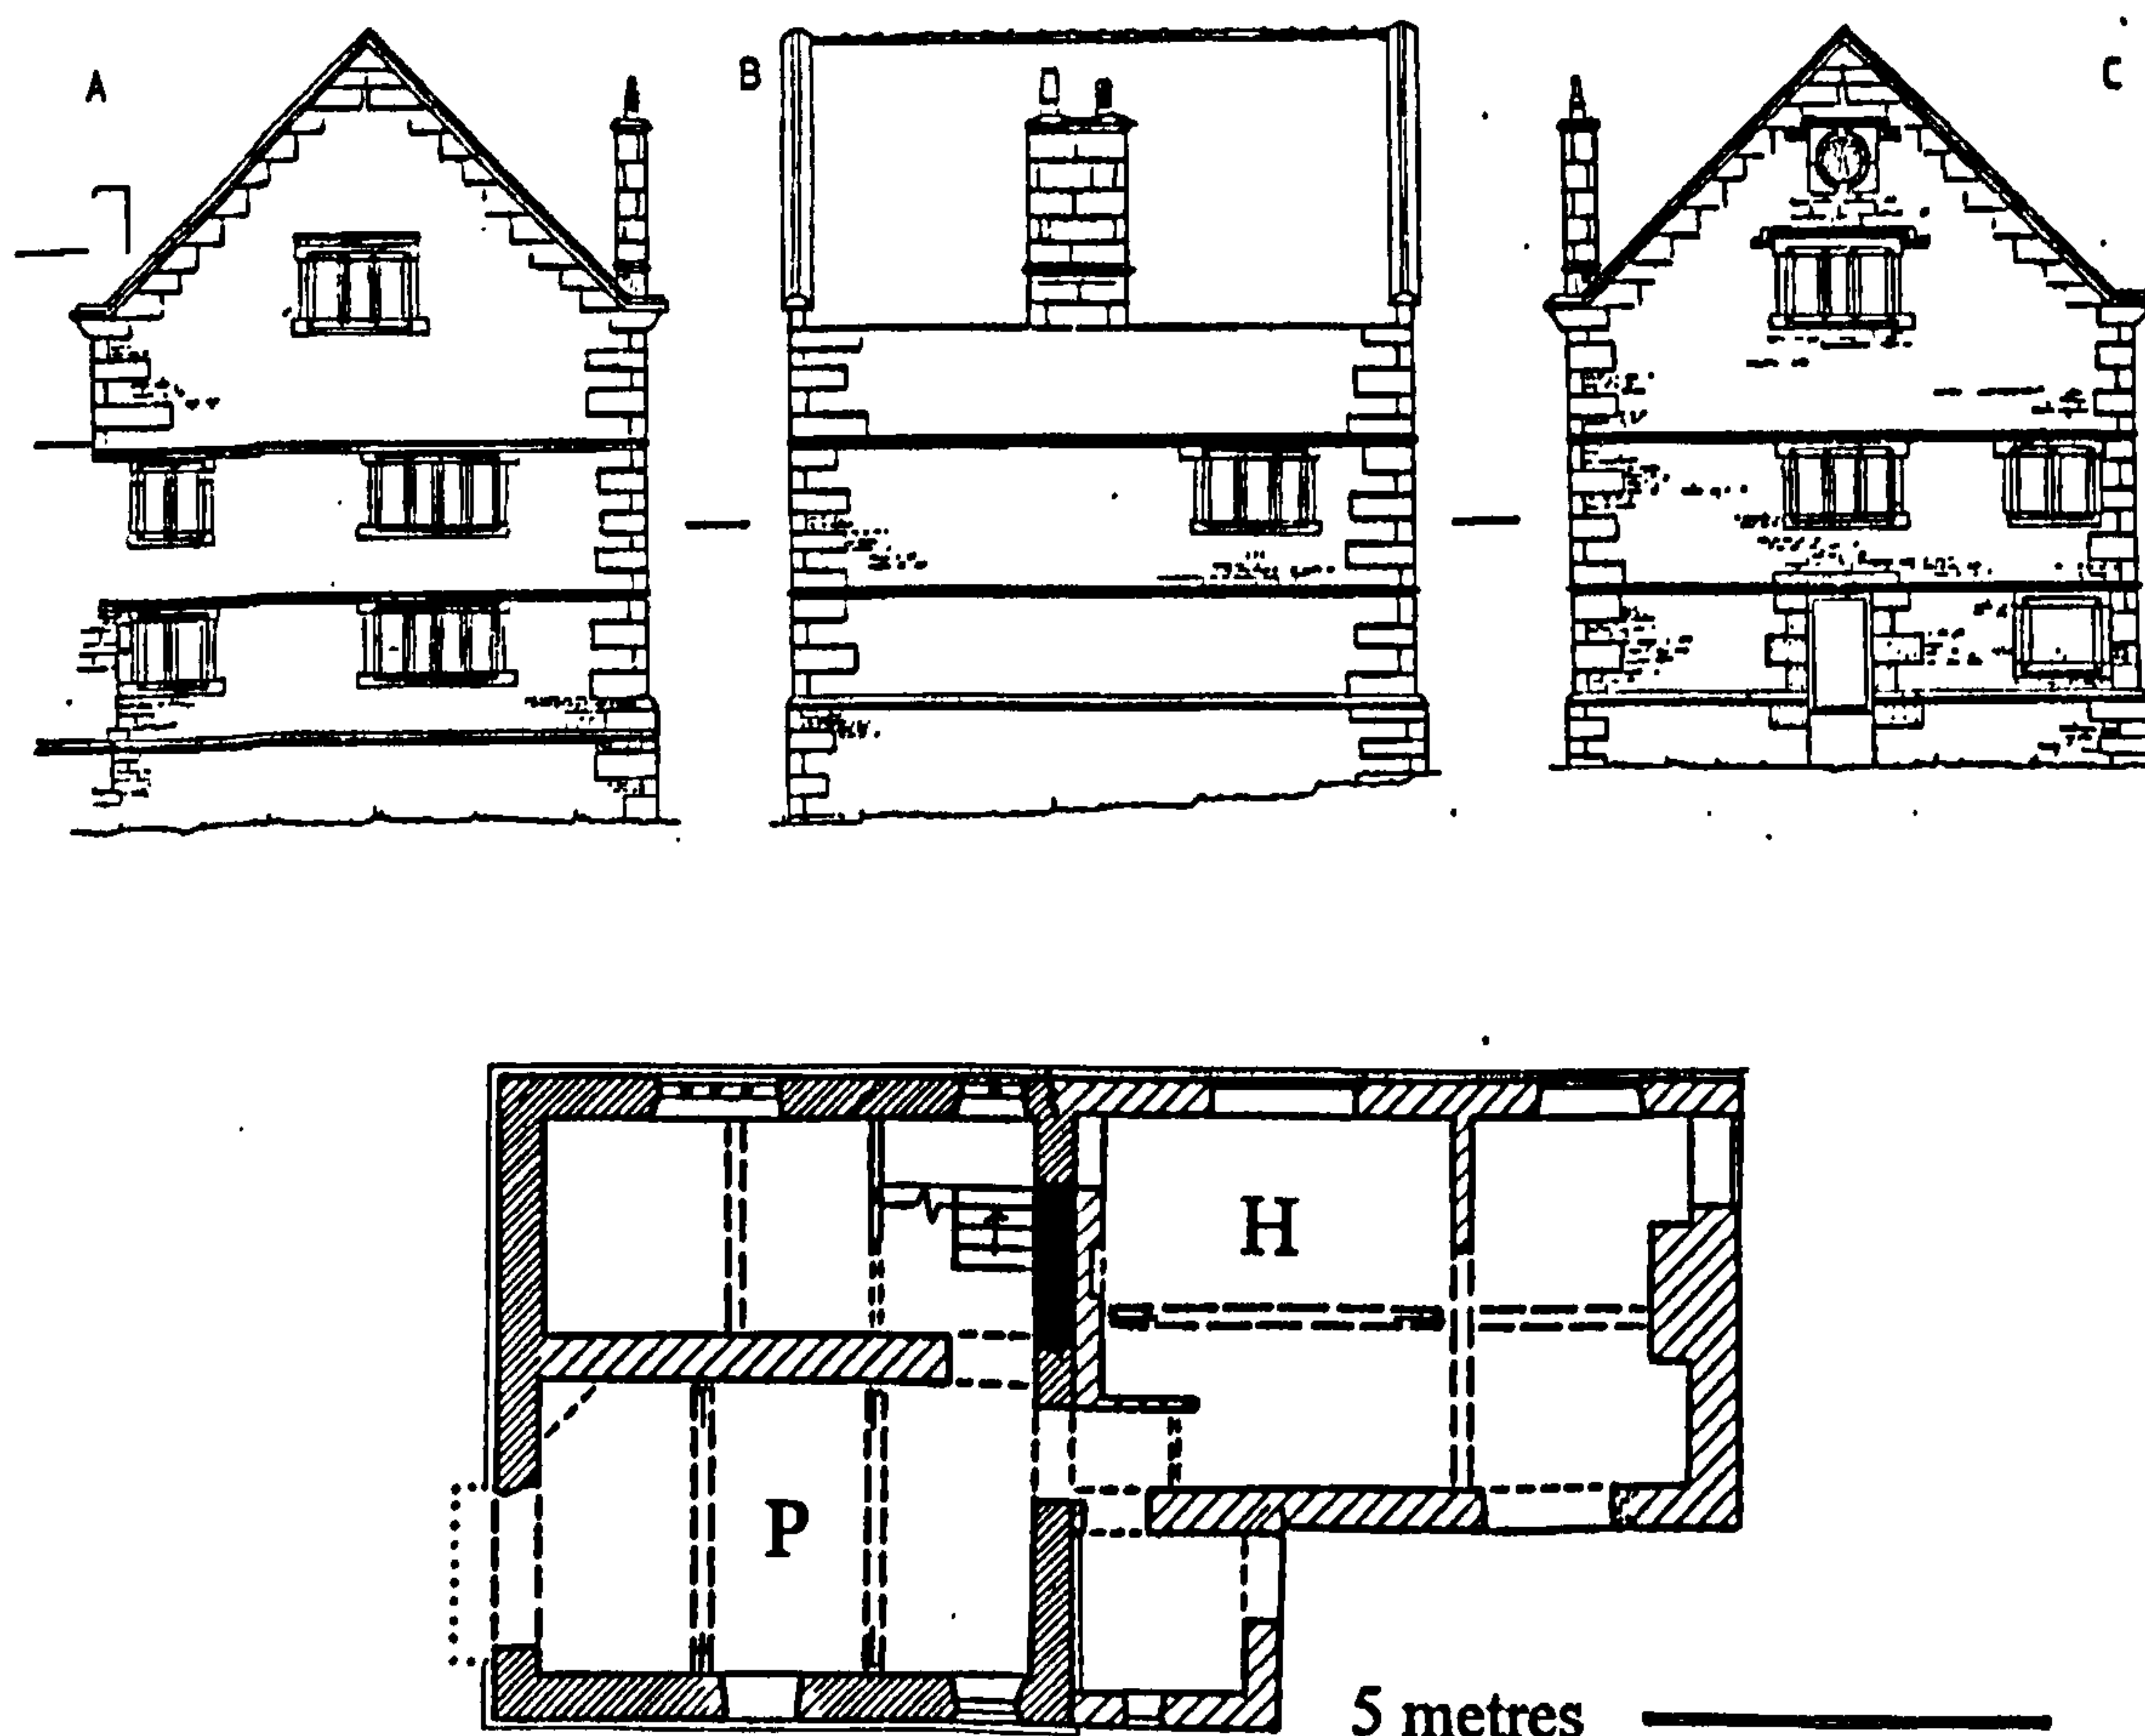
Woodhouse Green (2): elevations of the parlour wing and ground plan.
